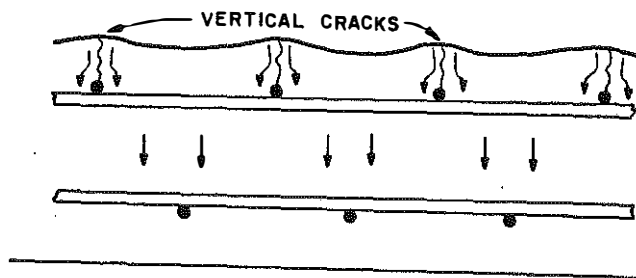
Possible Cause of Early Cracking in Steel Reinforced Concrete.
